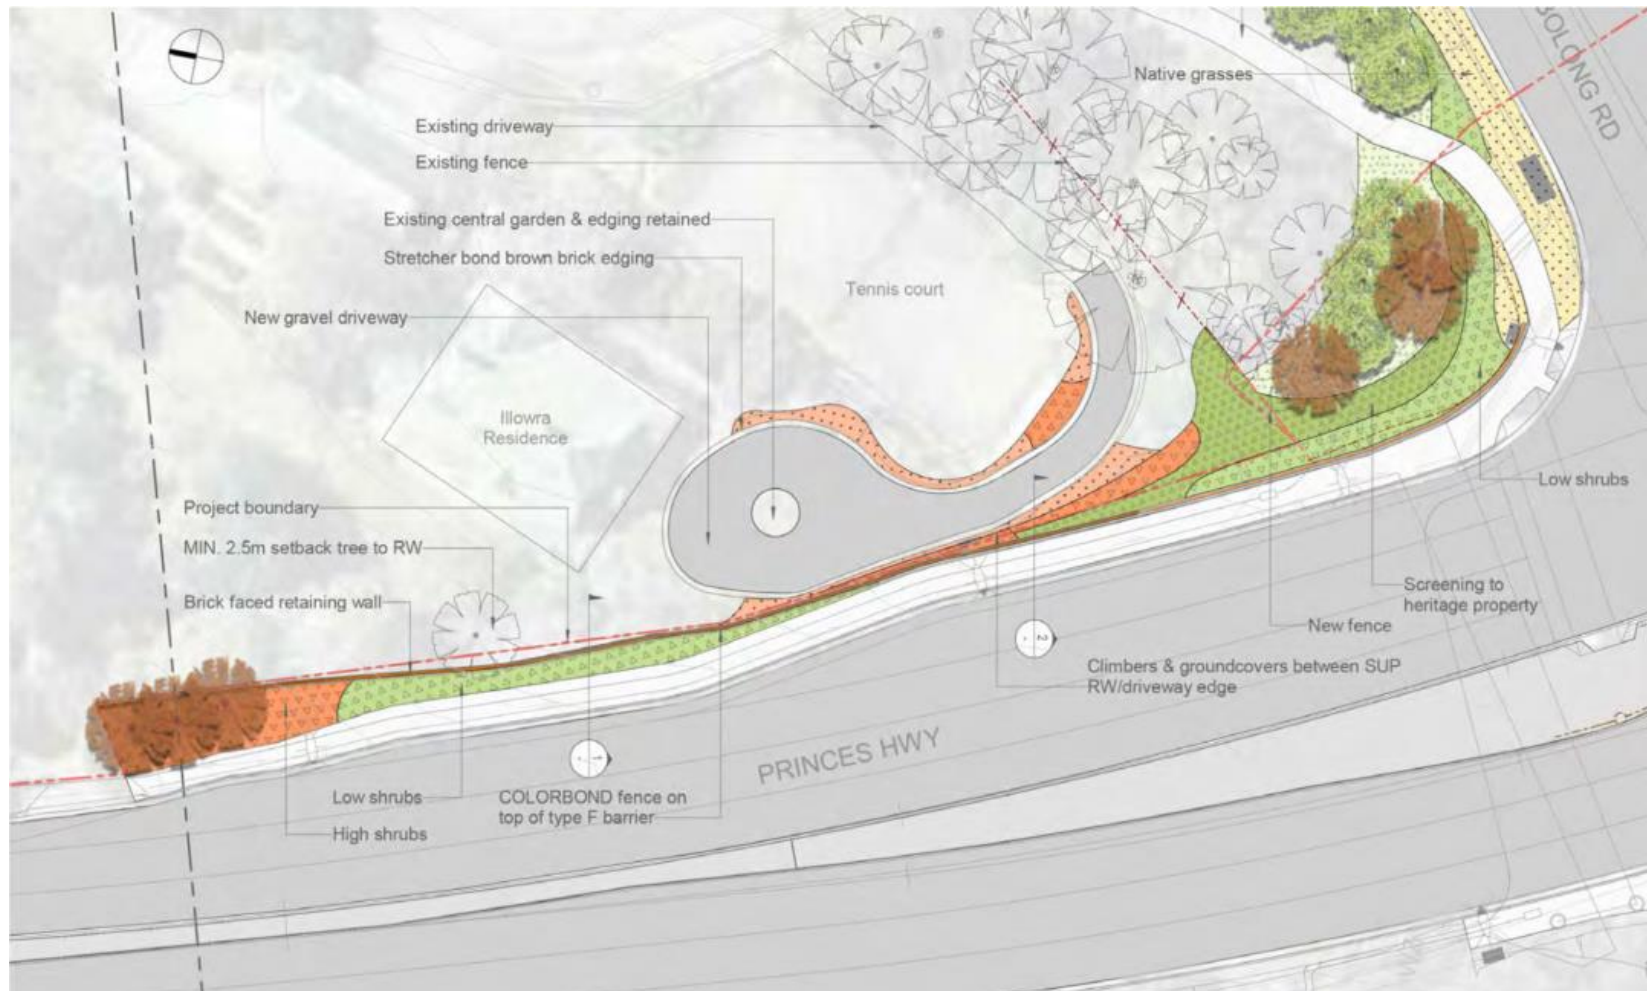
Detailed landscaping plan for the proposed works. Source: TfNSW
